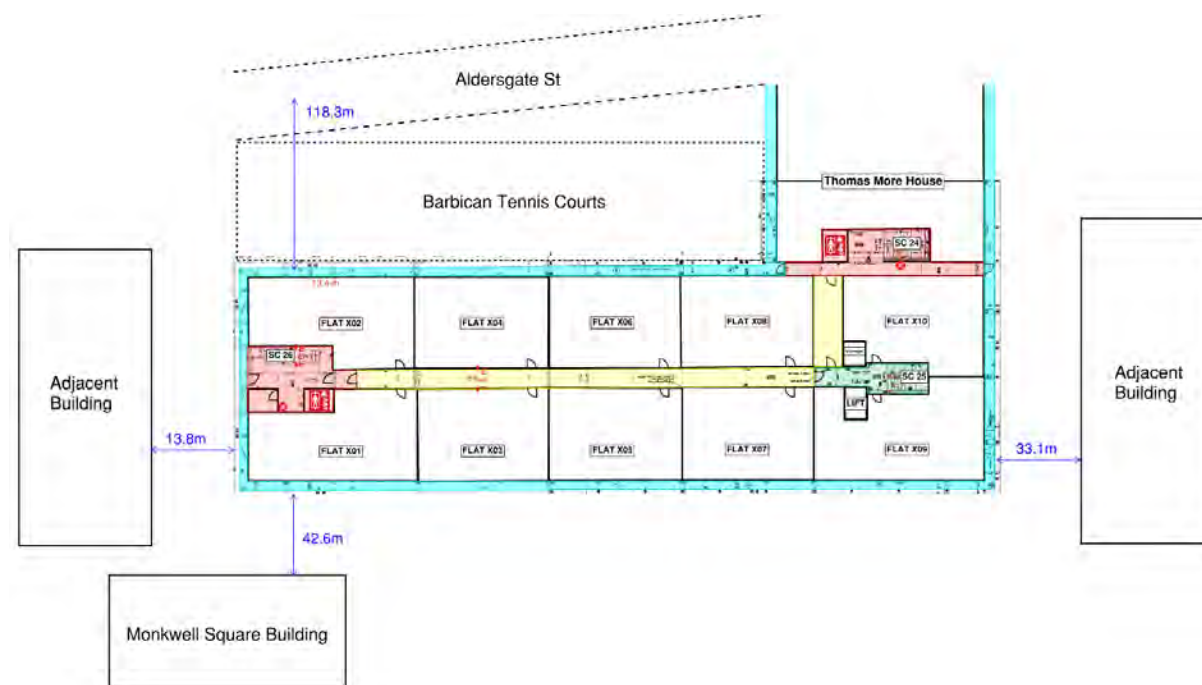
Existing arrangement for Mountjoy House and adjacent buildings
